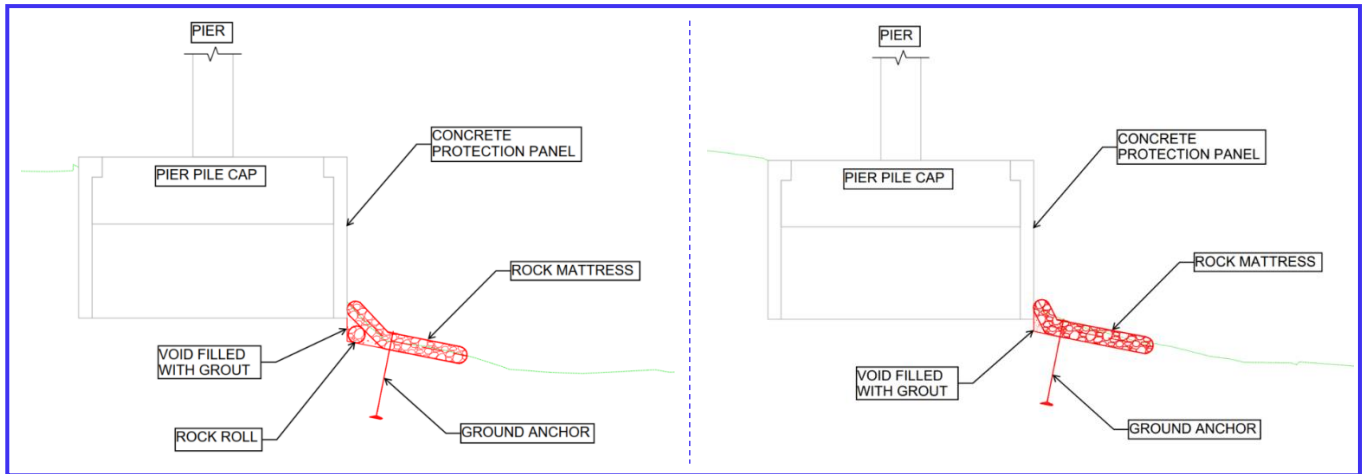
Extract of scour protection sections for southwest and northwest piers respectively
